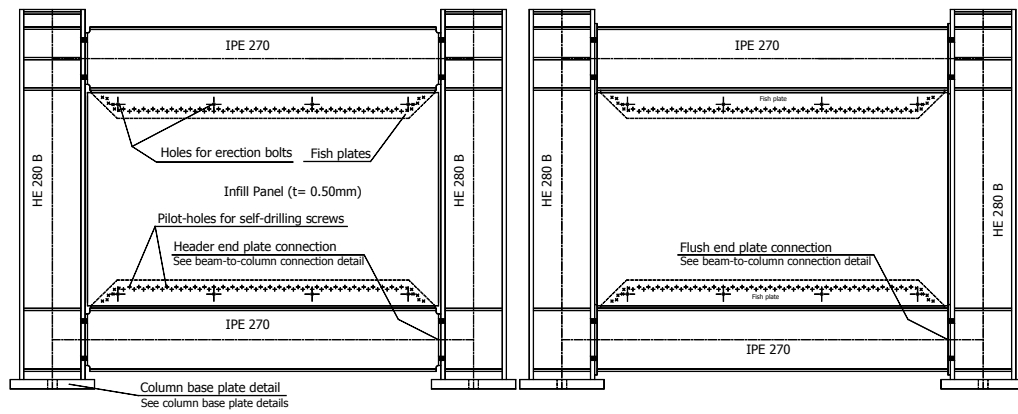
Test Specimens of TSPSWs with Panels Connected to Beams Only
